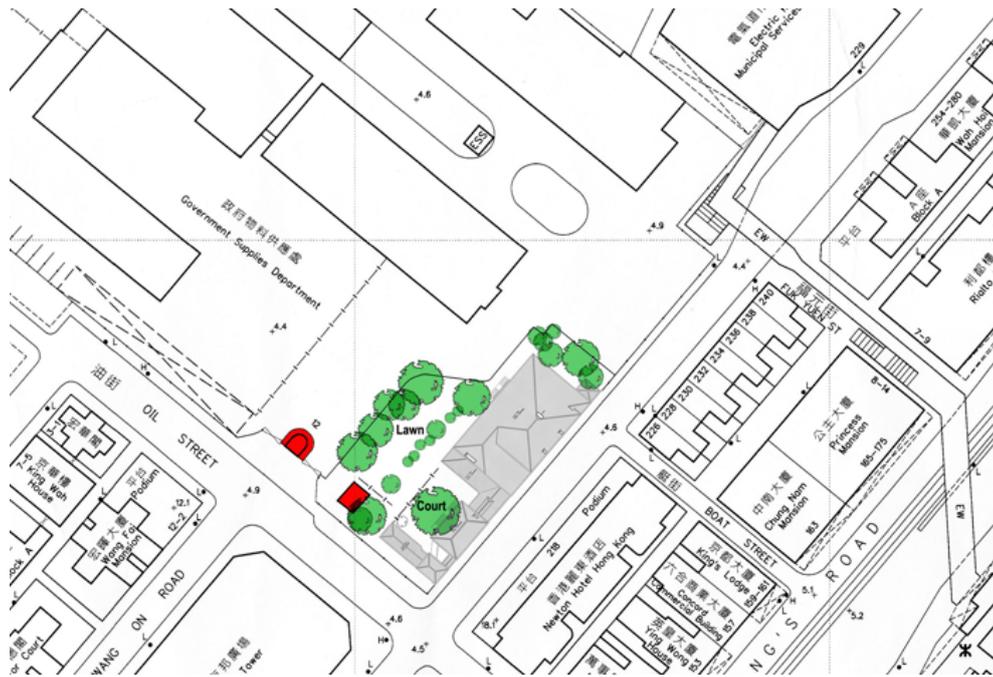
Site plan showing the surrounding landscape and structures of the former clubhouse.
